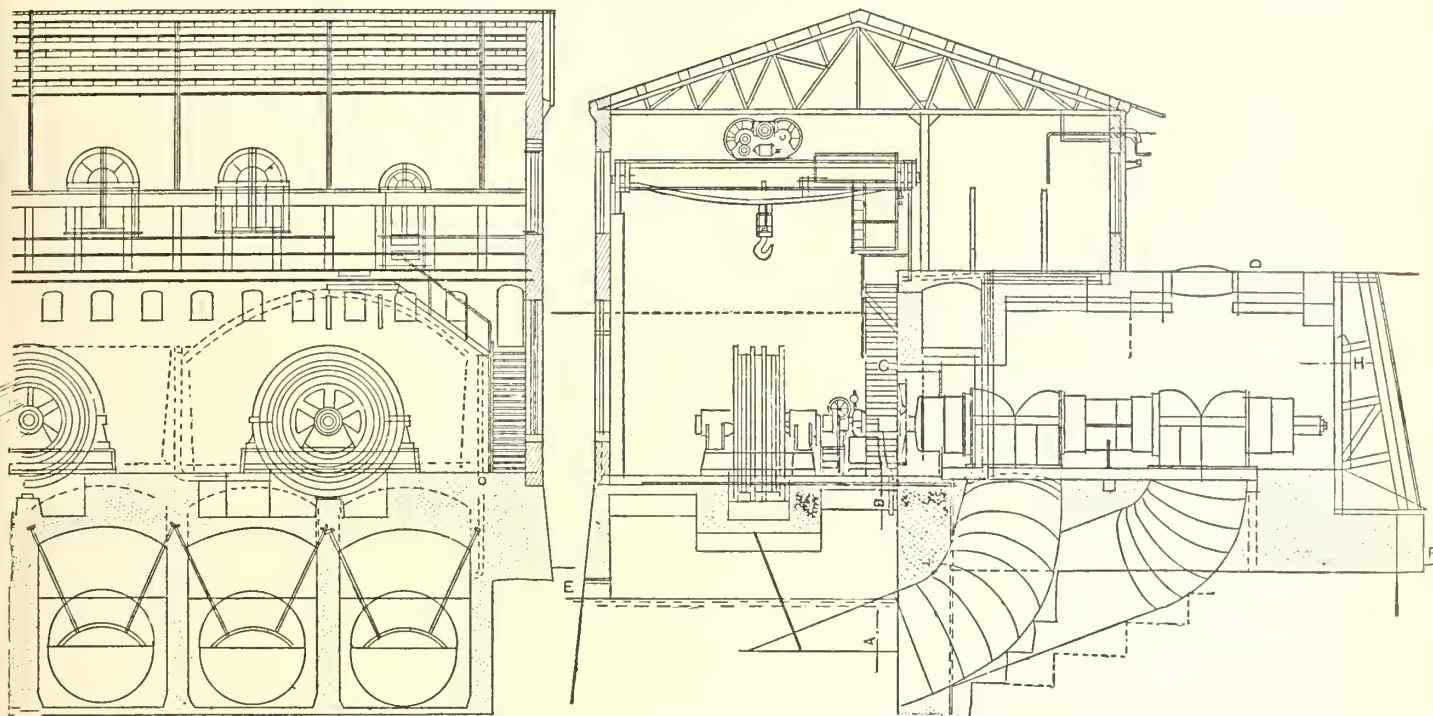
SECTIONAL ELEVATIONS THROUGH WHEELS AND POWER HOUSE.
